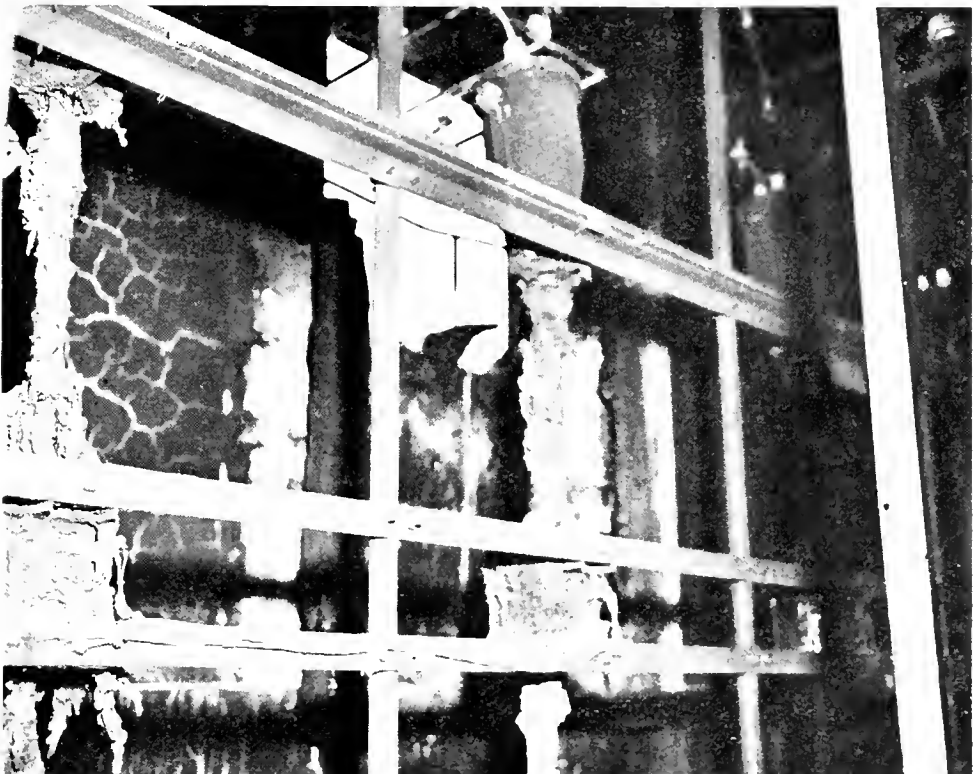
Kojimachi substation—Wooden blast barriers over windows burned and damaged cable entrances
